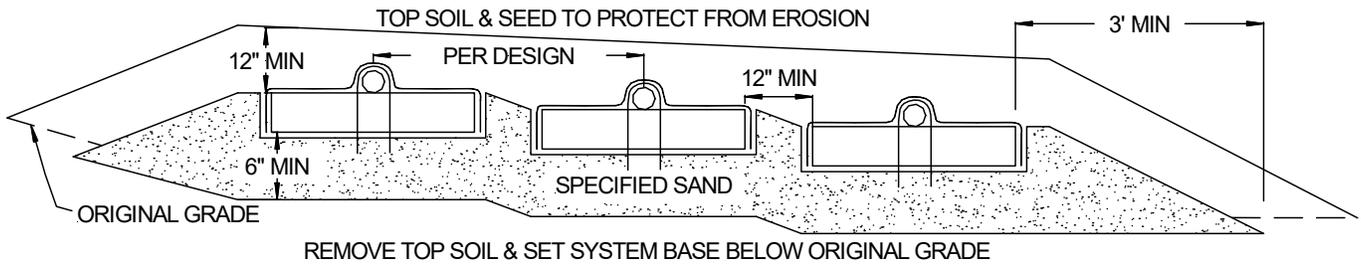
SECTION VIEW – SLOPED RAISED EDA SYSTEM
